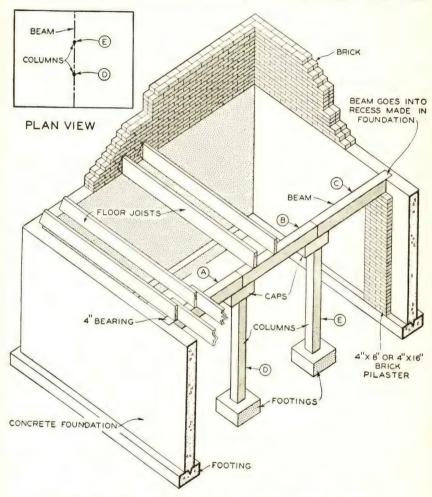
Wood Columns for Use with Wood Beams in Small Residence
